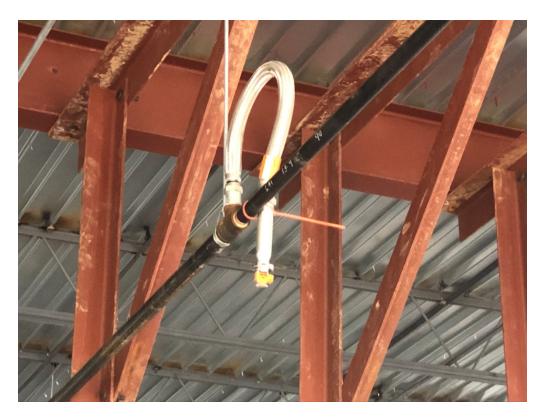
Flex Drop for Sprinkler (typical and 90% complete in East structure)
